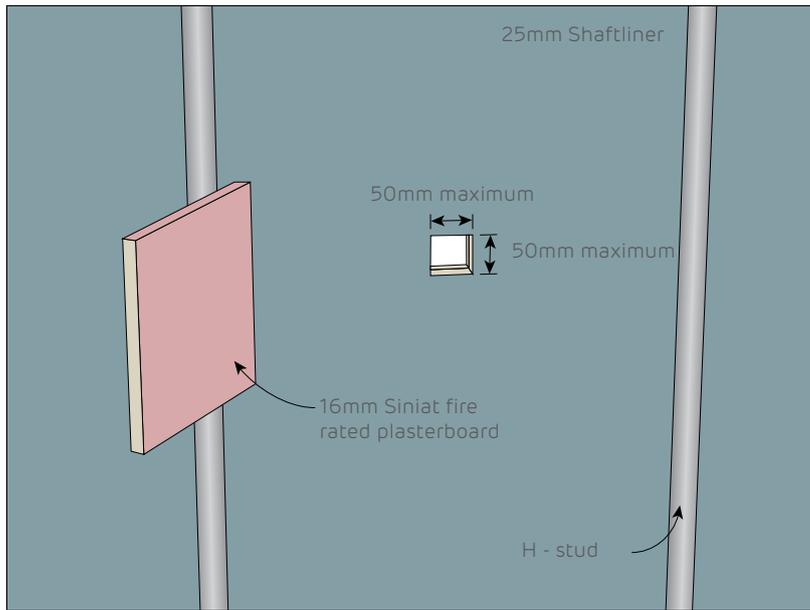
Plumbing and Electrical Penetrations in Wall Linings
